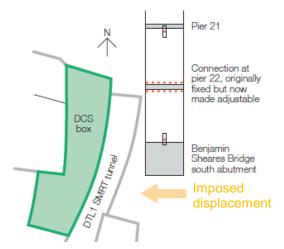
Plan of south end of the Benjamin Sheares Bridge.
